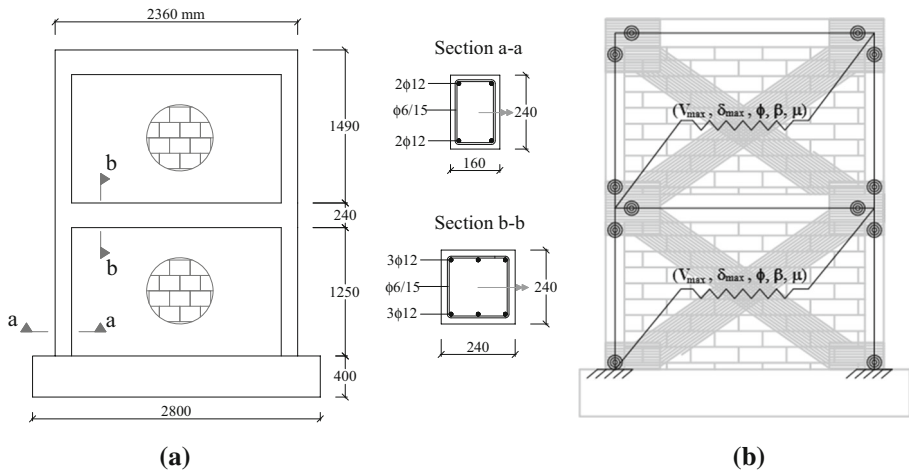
The dimensions and reinforcement details of the specimen (all dimensions are in mm). a Dimensions and reinforcement details. b Analytical model
